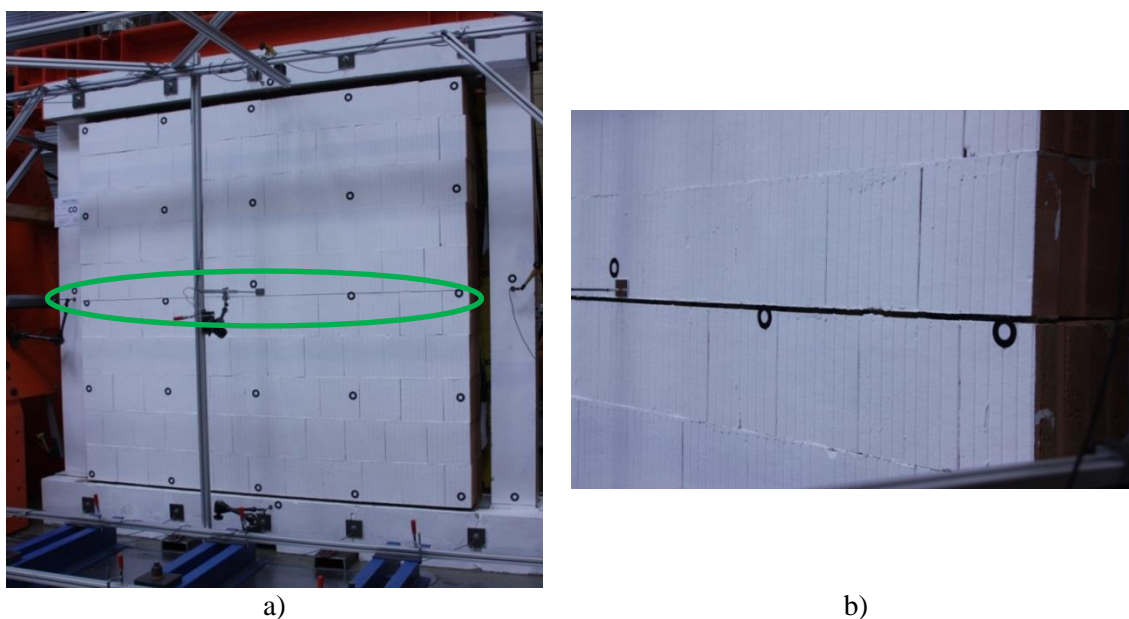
a) Failure pattern and b) gapping of bed joint in the wall at the end of Test CO
